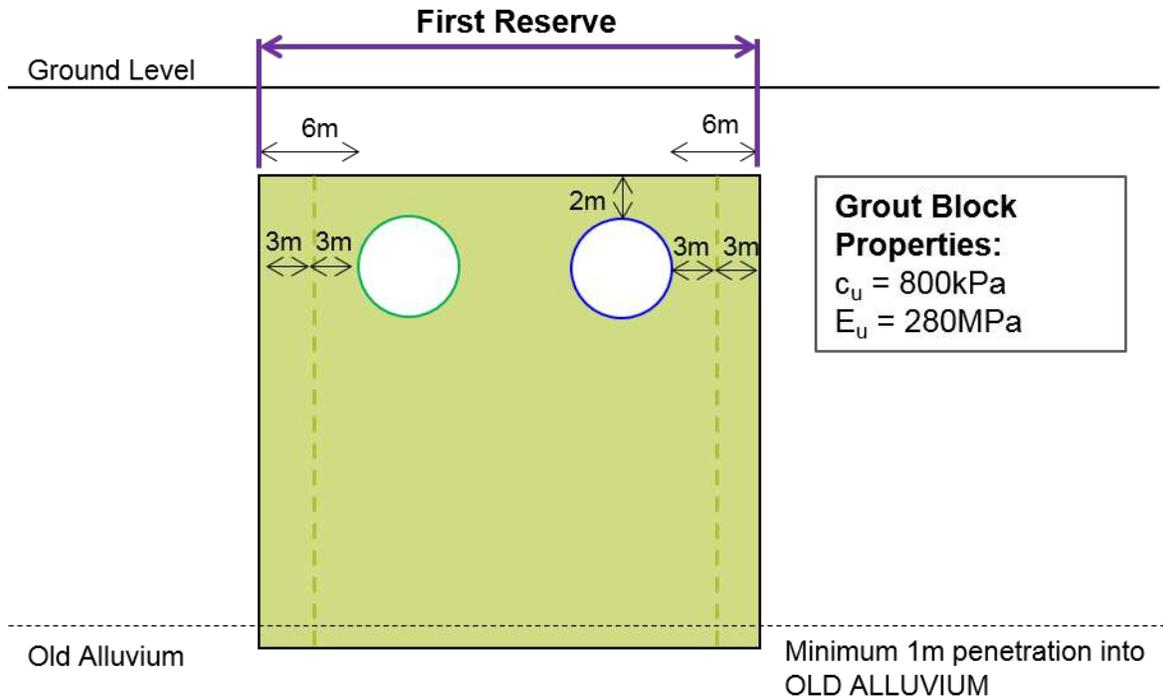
Original design for ground improvement (DSM) to limit tunnel settlement.
